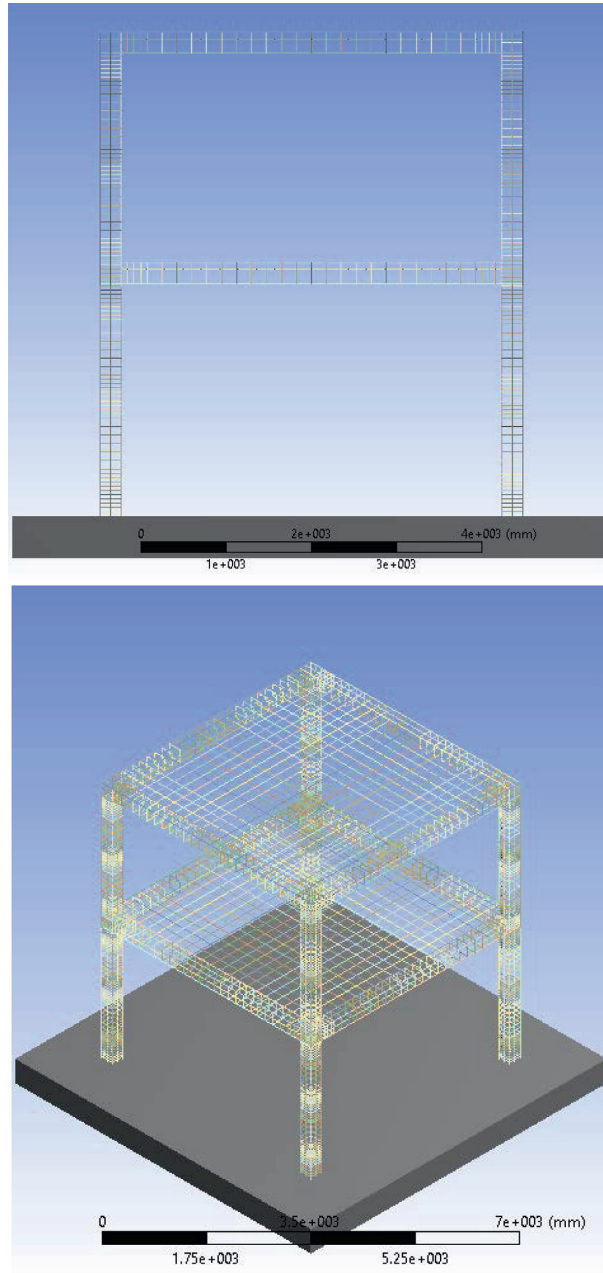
Reinforcement detailing for FRM_REI_DET_#3 on AUTODYN.
